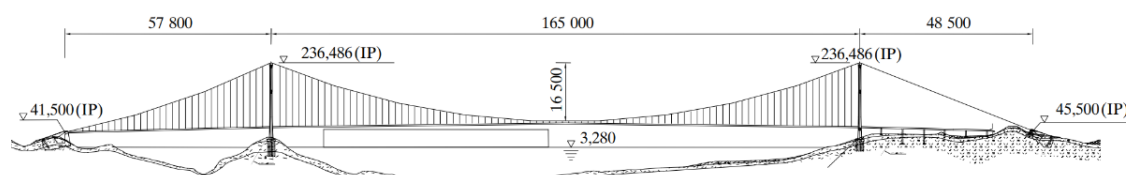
Span arrangement of the Xihoumen Bridge (Units: cm)[17]
